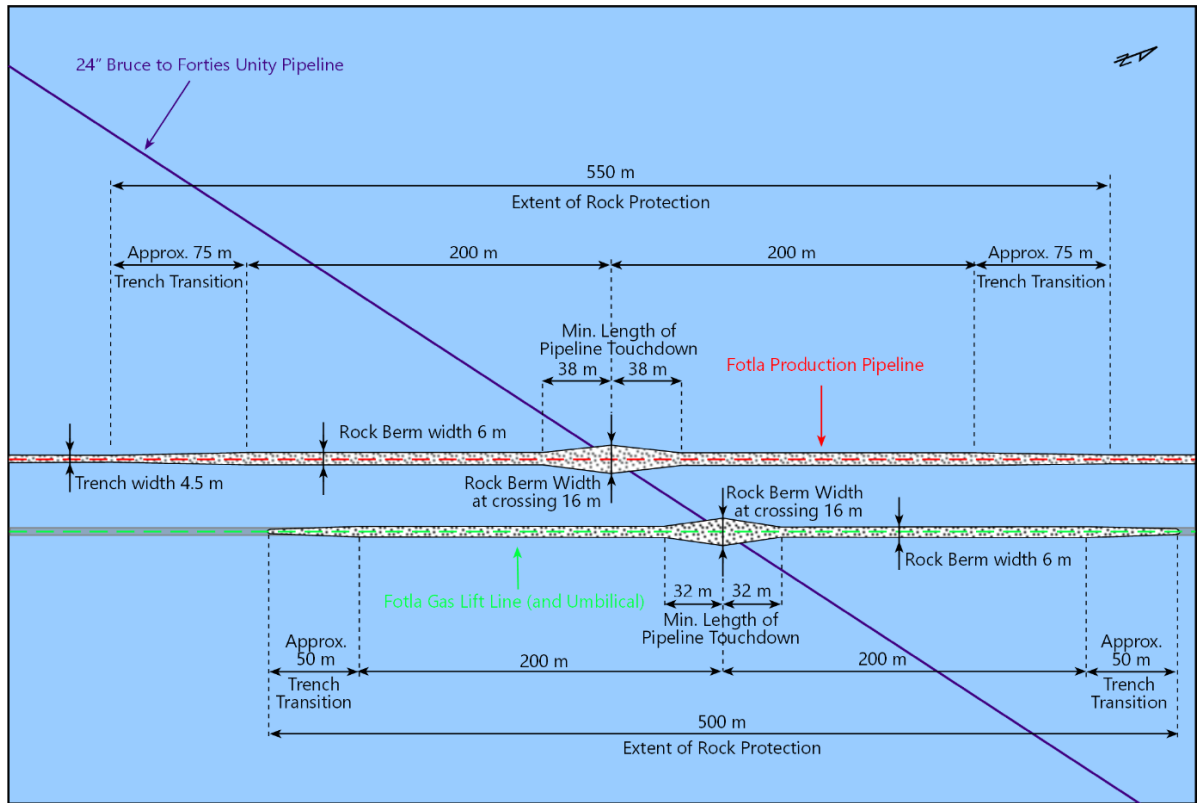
Plan view of protective rock placement at the pipeline crossing footprint
